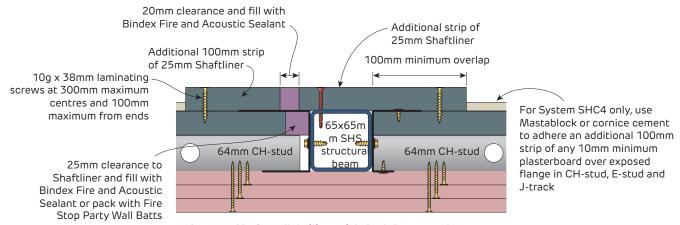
Shaft Wall Ceiling with SHS Structural Beam
